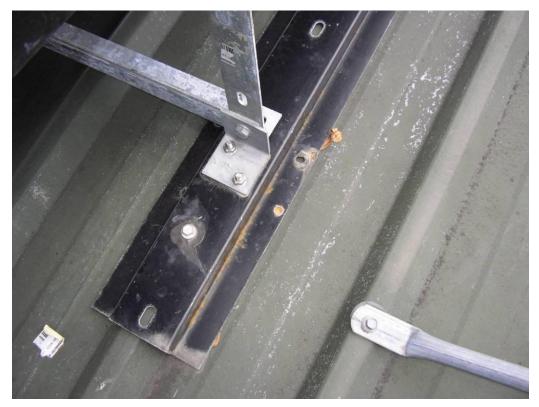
Stainless steel bolts, galvanised steel roof and brackets, no separators.
